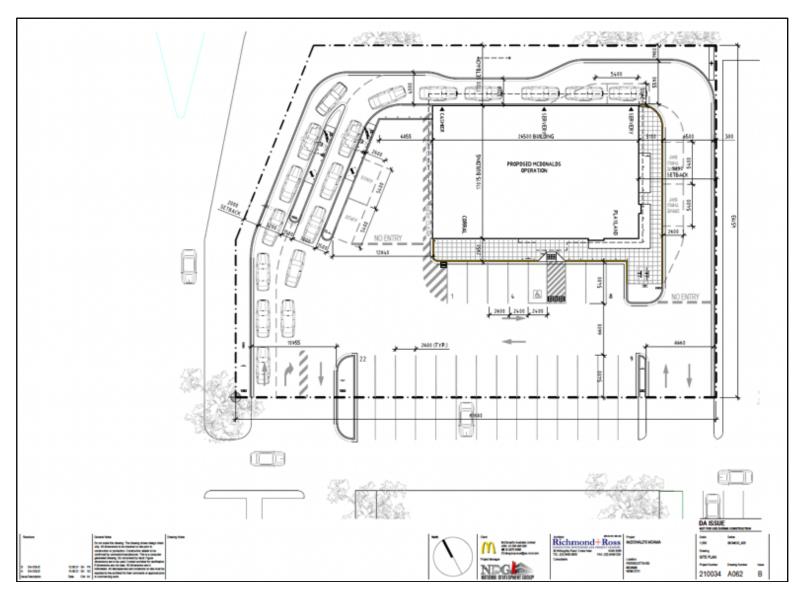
Detail site plan showing dimensions from the site boundary. Richmond and Ross Consulting Engineers (2021)
